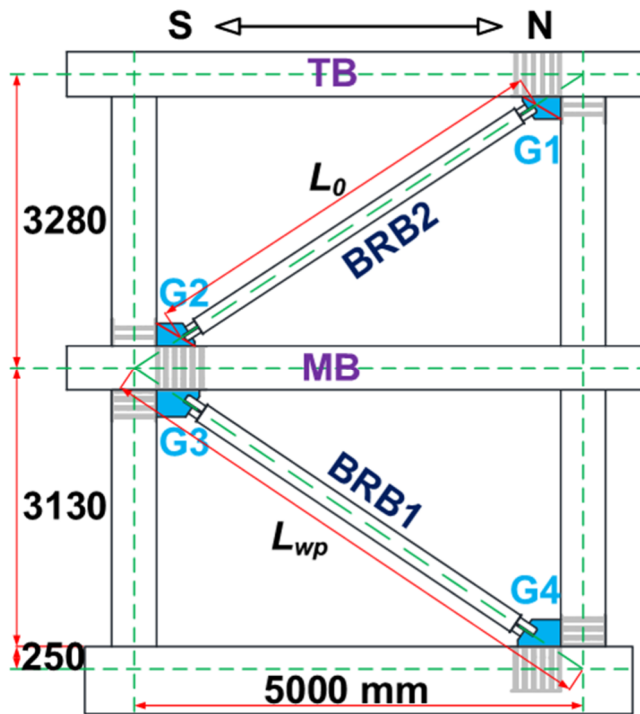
The tested cast-in-place concrete frame of Tsai [12], moment-resisting connections between beam and column members
